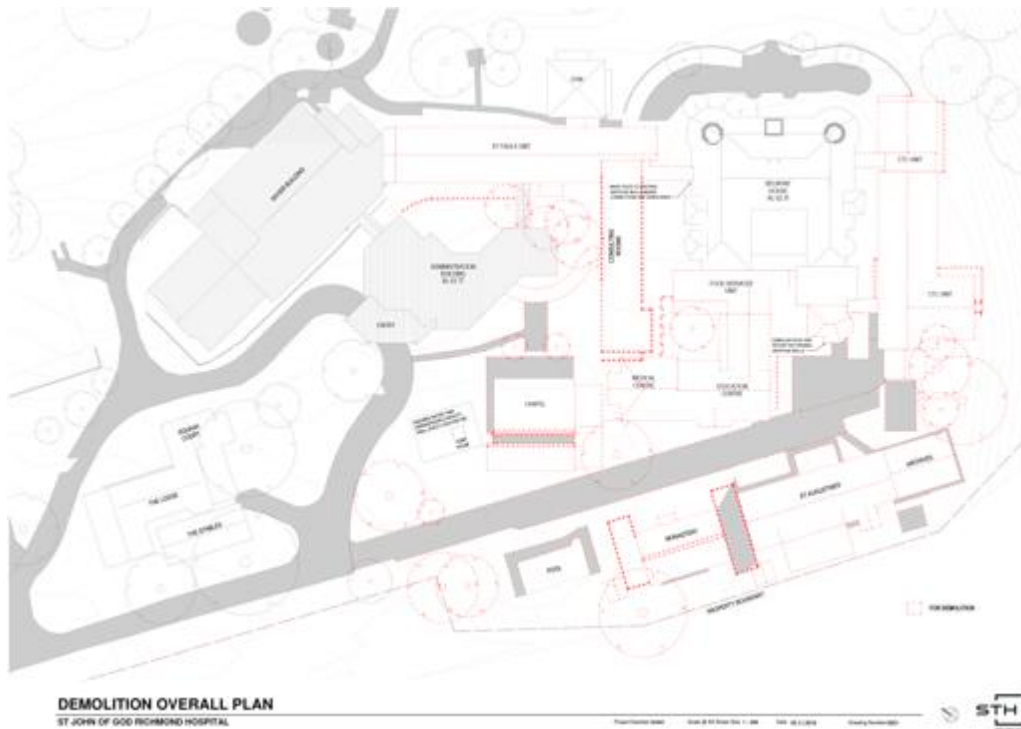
Demolition Plan. Items to be removed noted in red. Silver Thomas Hanley. 2019.
